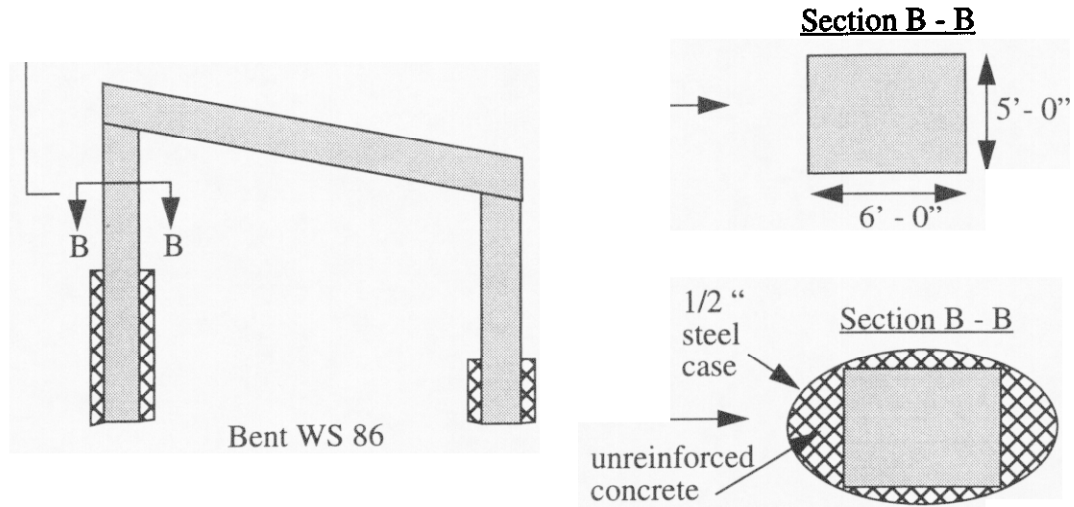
Retrofit of columns with filled, oval steel jackets
